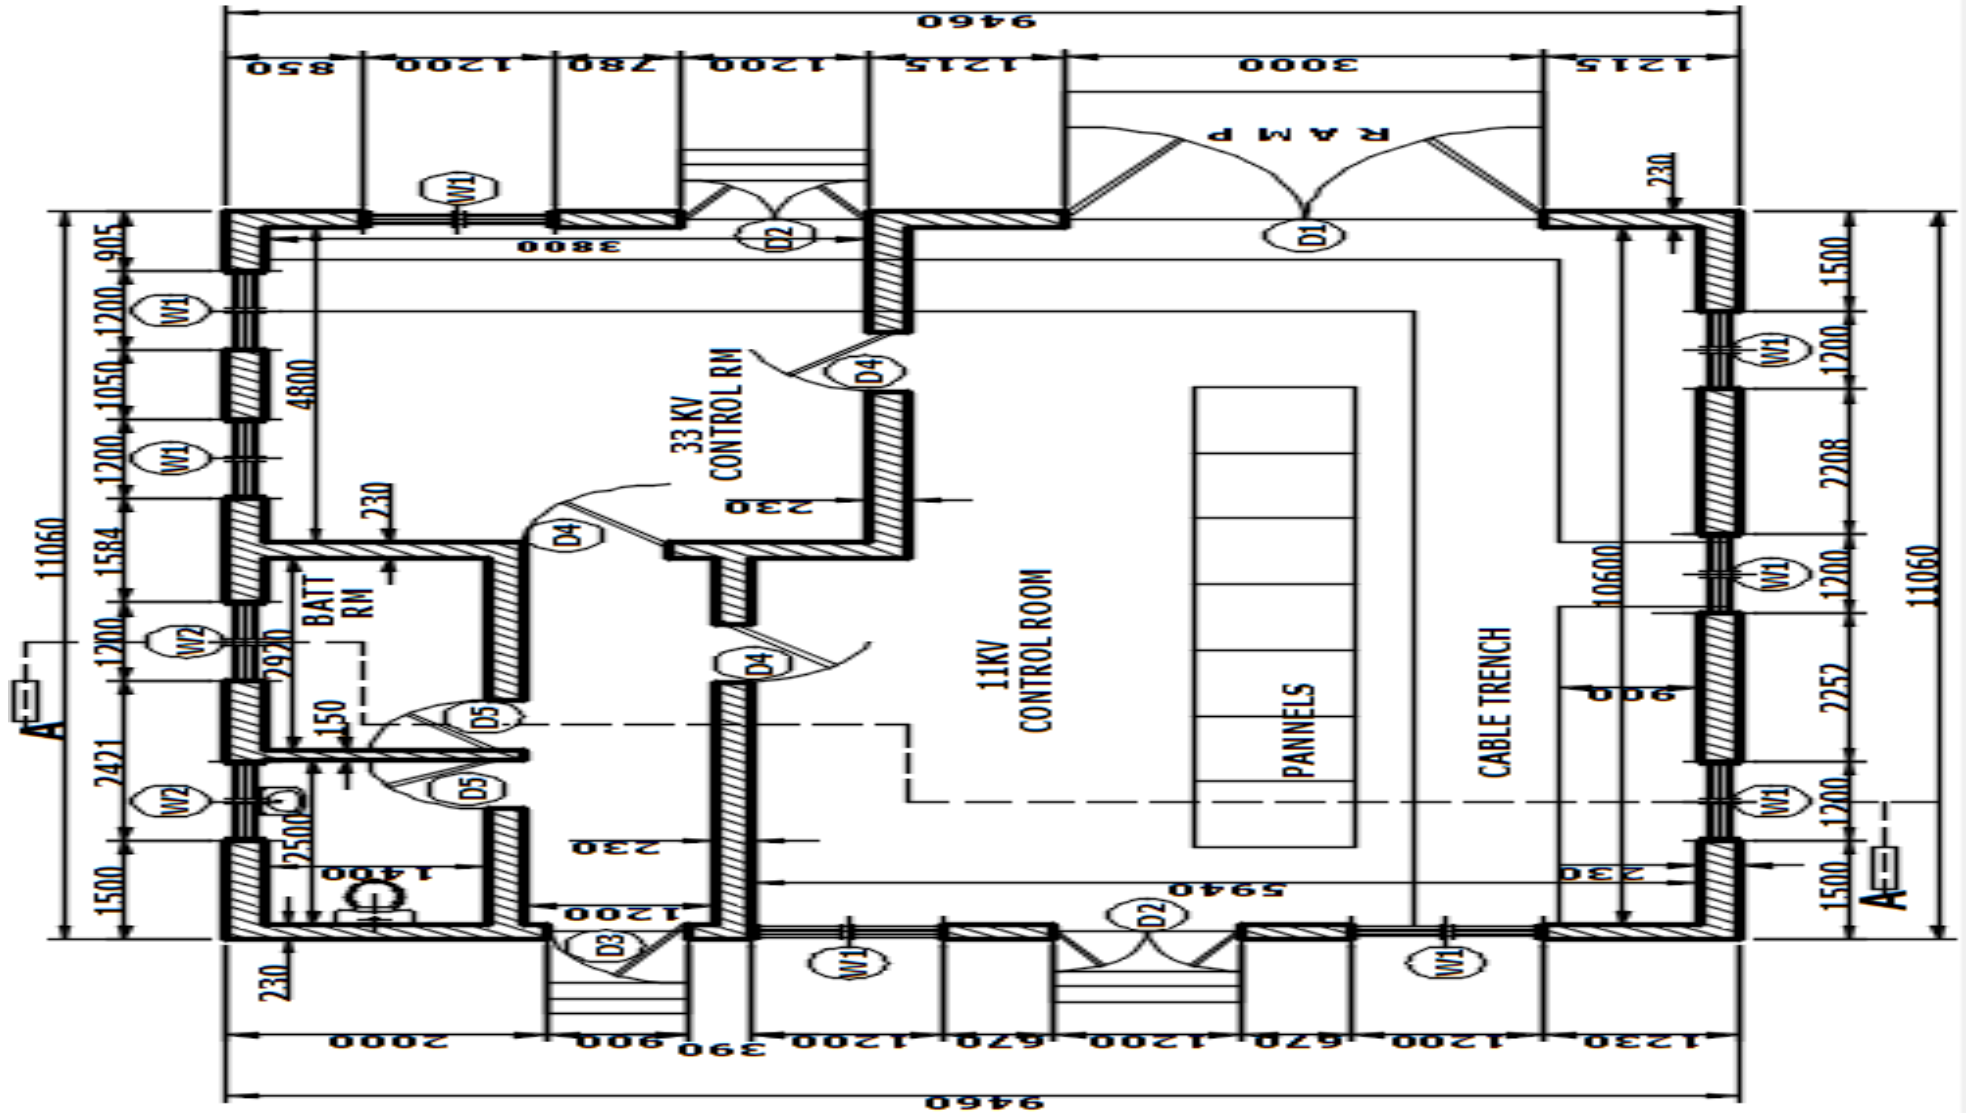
Floor Plan of a Substation Control Room (All Dimensions in mm)
